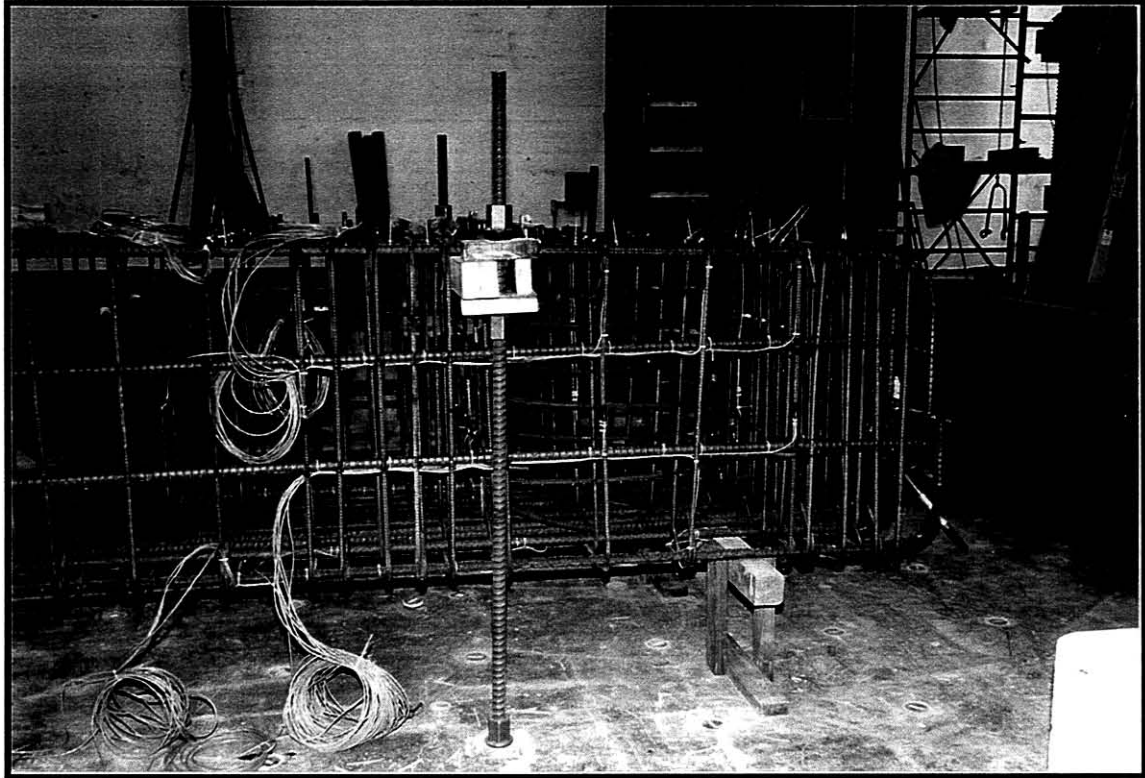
A Completed Footing Reinforcement Cage Prior to Casting
